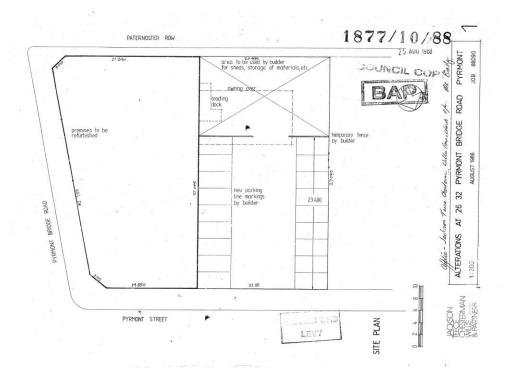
1988 – Site plan prepared by Jackson Teece Chesterman Willis & Partners as part of BA 1877/88, dated August 1988 (Source: City of Sydney Archives, Pyrmont Bridge Rd (26-32) Pyrmont. Gilbeys Australia. Refurbish existing warehouse with alts. (01/01/1988 - 31/12/1988), [A-00574747]. https://archives.cityofsydney.nsw.gov.au/nodes/view/1457240)
